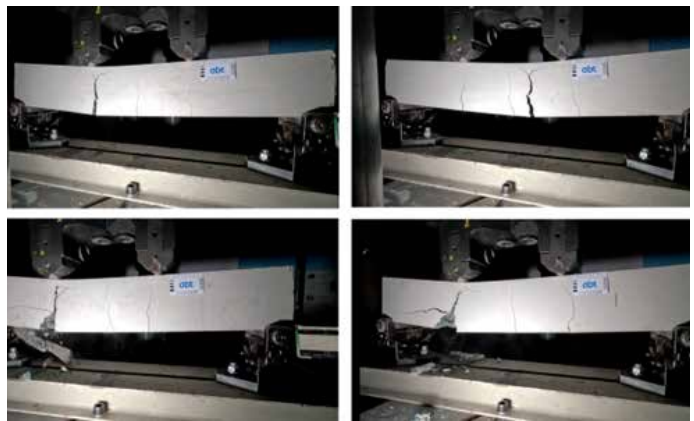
Beam tests with rebar just before collapse. Only regular rebar (top) and basalt reinforcement (bottom)
